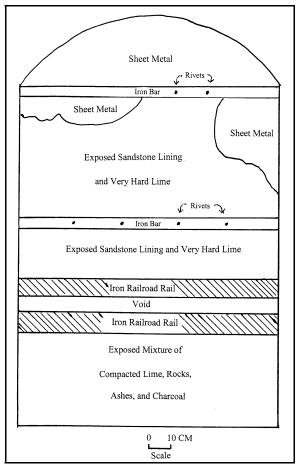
Drawing of the Rear of the Arch Passageway Showing the Details, Facing North.
